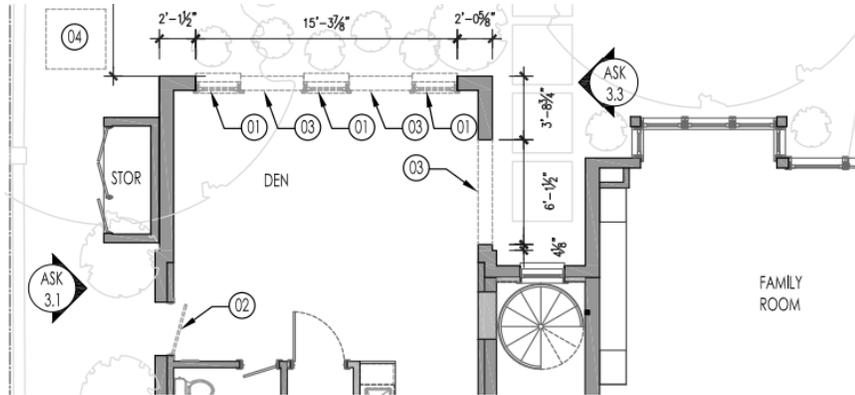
Site plan showing areas of demolition/capsulation in the rear.
